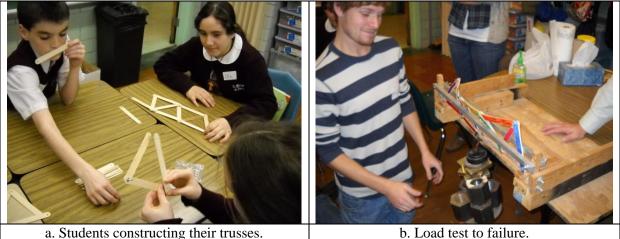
Construction and load testing of a two dimensional popsicle stick truss bridge.
